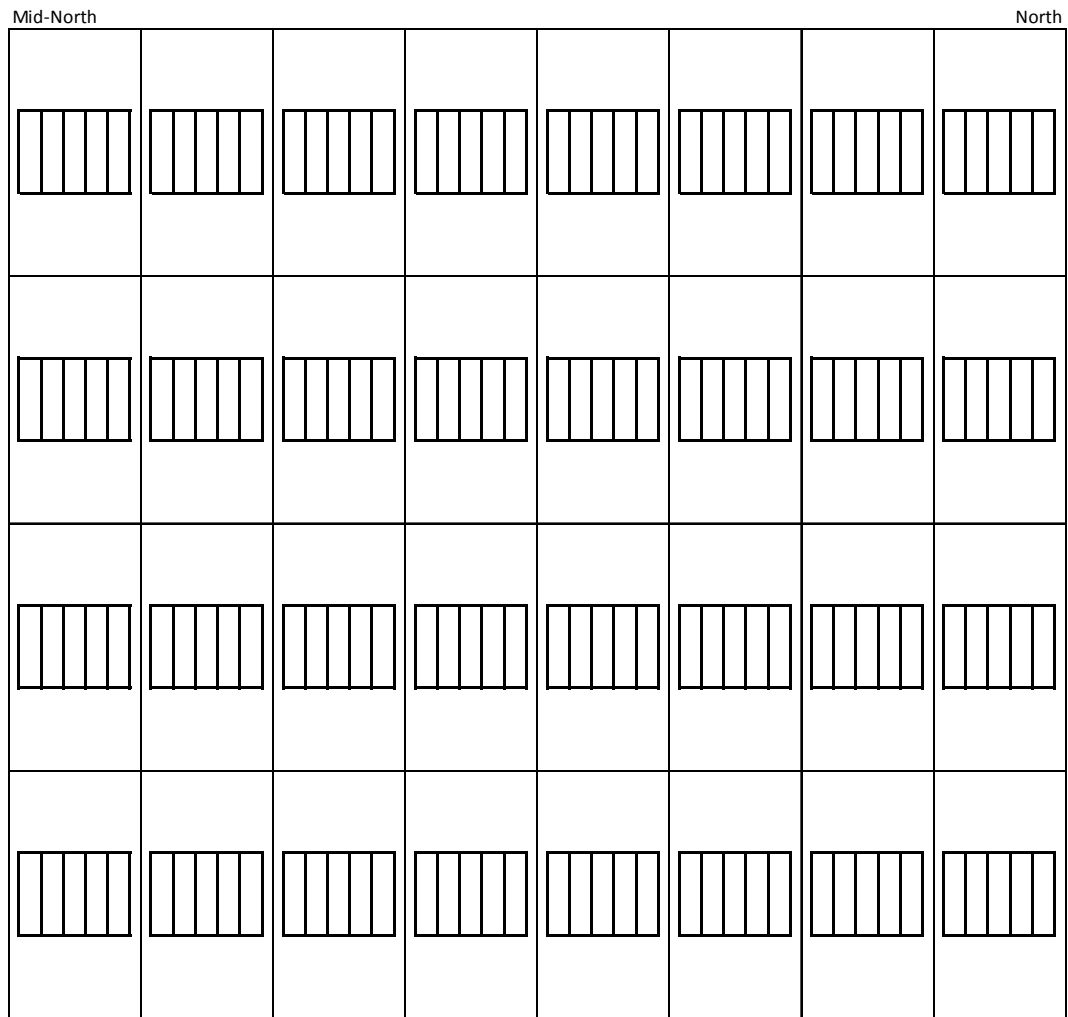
DIA17R: Fastener failures during inelastic test (5/5)
